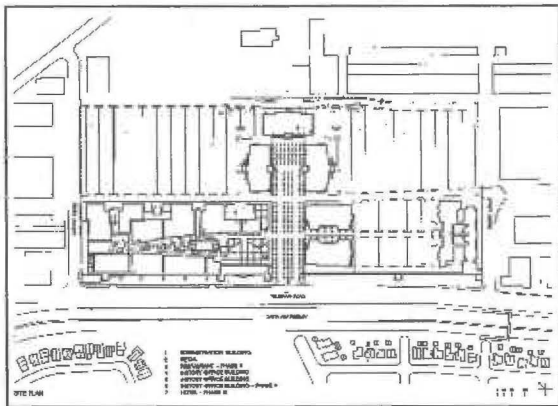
The Citadel site plan. (Photo courtesy of The Nadel Partnership)
